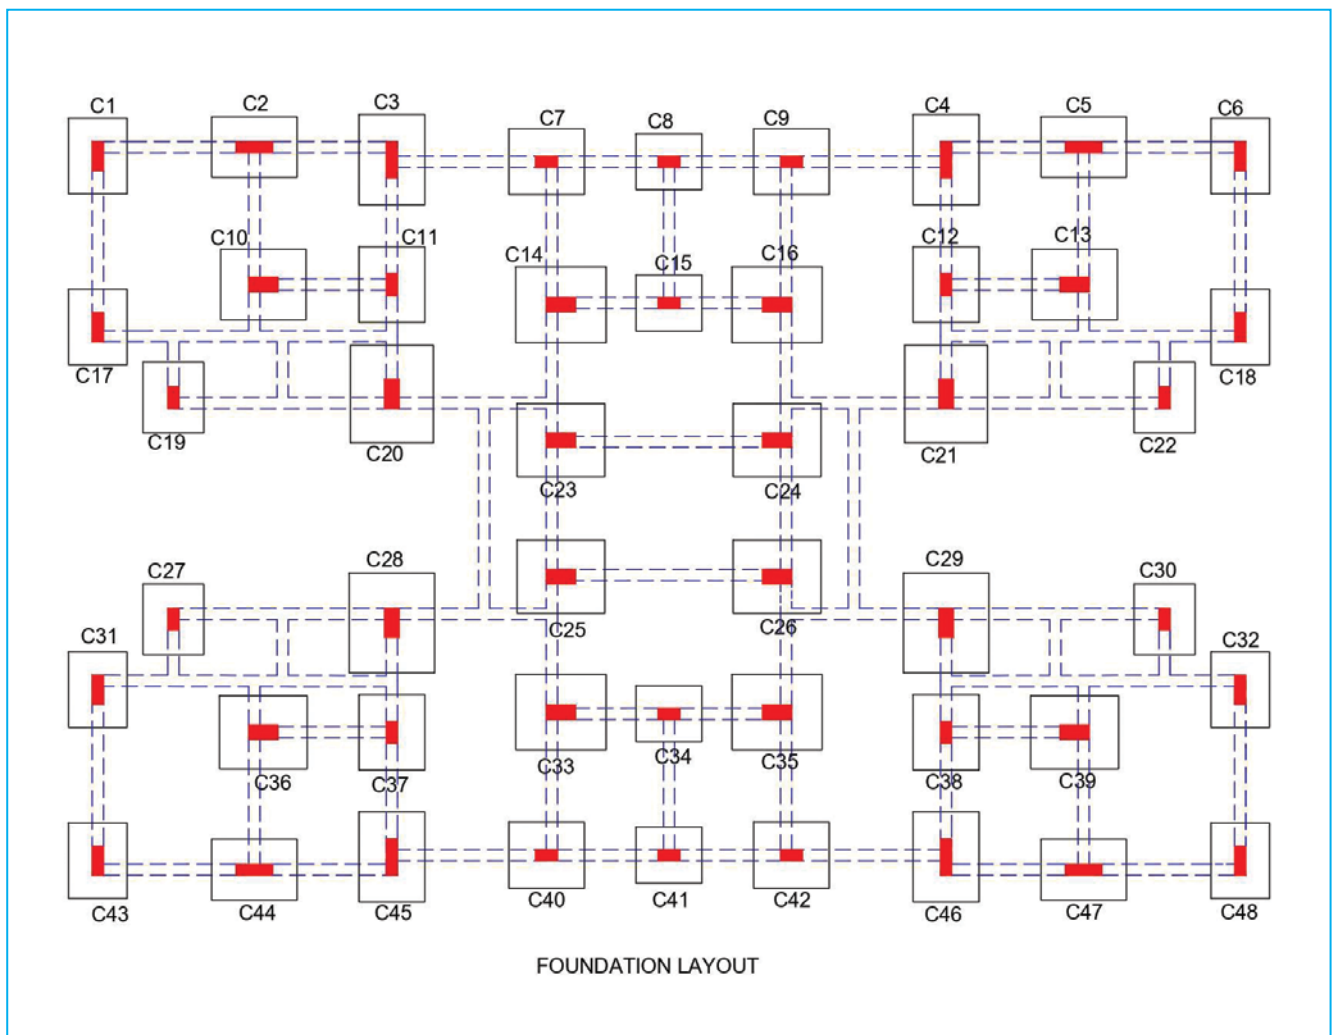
Building floor plan showing column and foundation layout for Alternative 1 (drawing not to scale)
